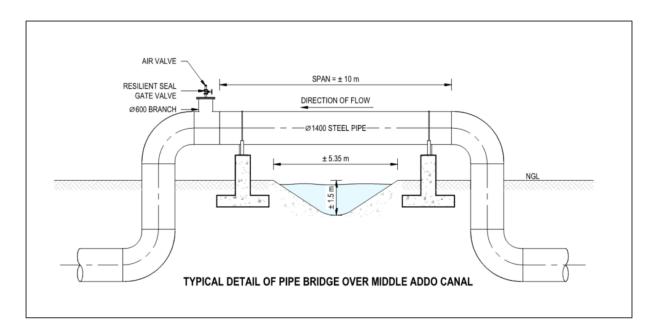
Typical detail of pipe bridge over Middle Addo Canal
